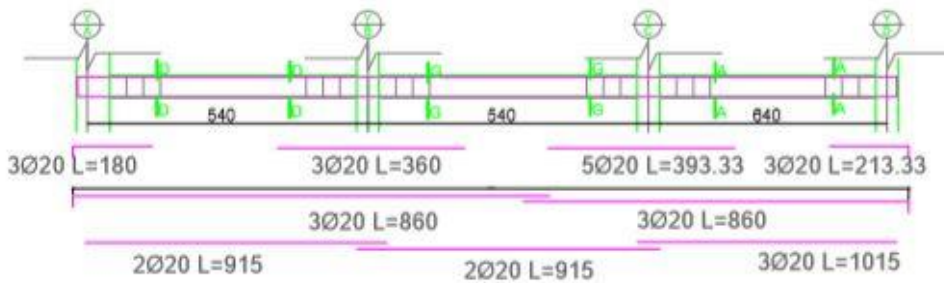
Roof floor beam A-B-C & D on axis 2
